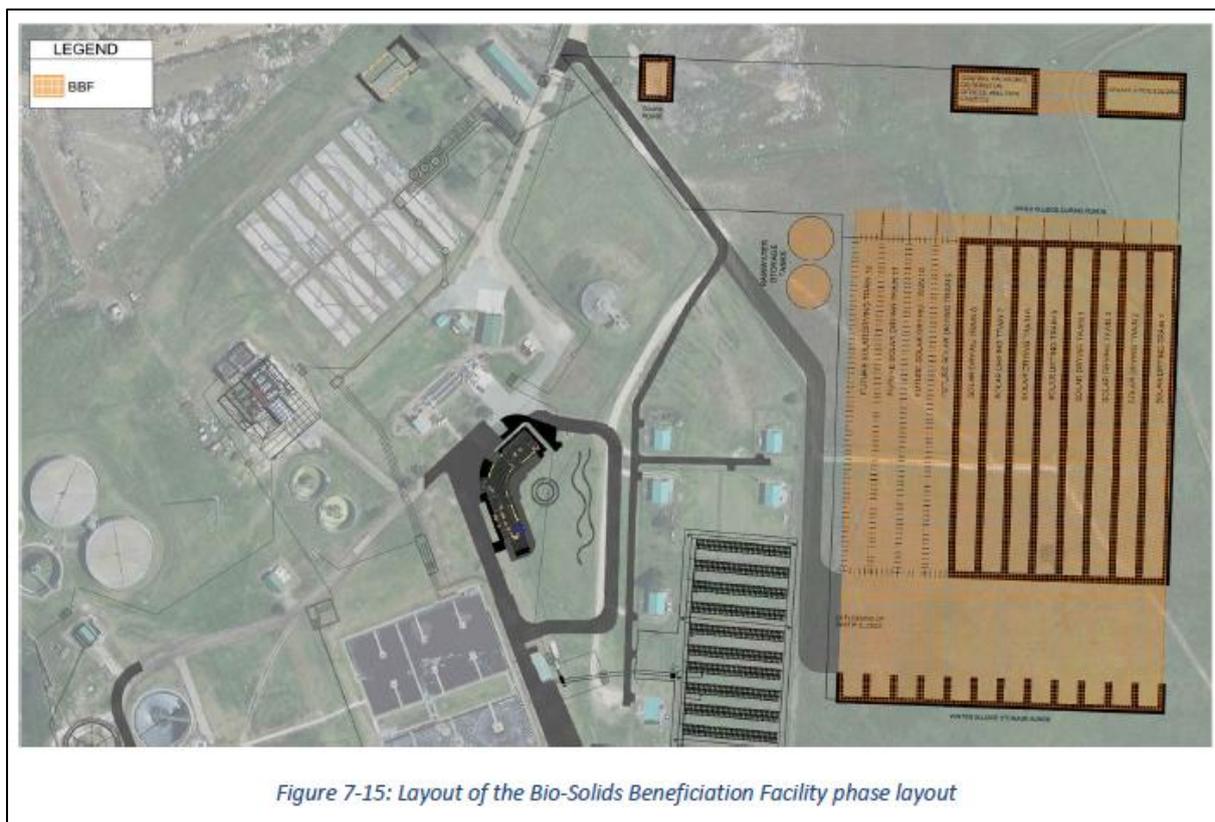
Proposed layout of the BBF taken from the Engineering Design Report
